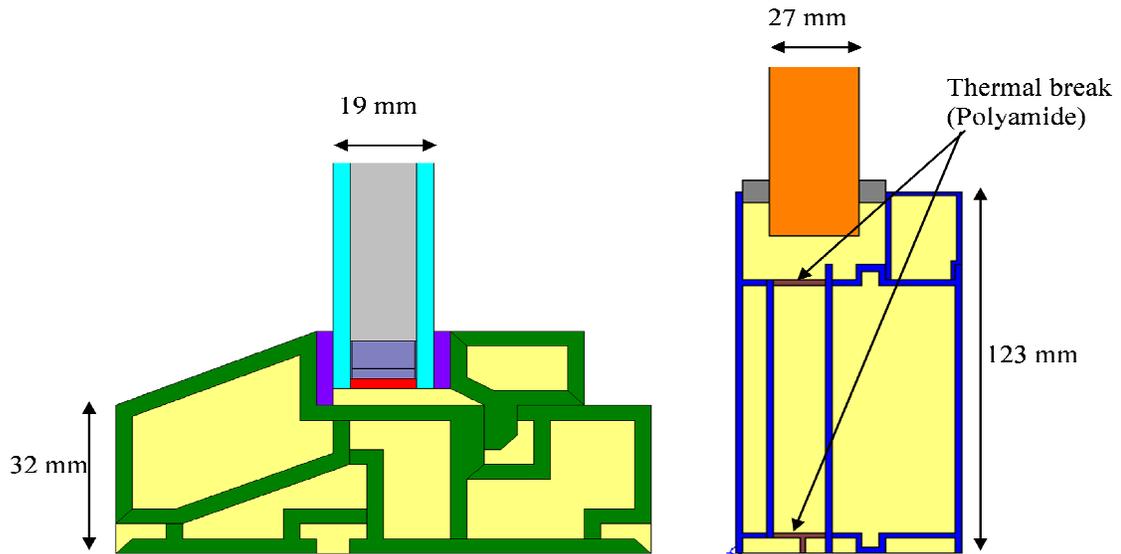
Cross section of window frames; To the left, a PVC window frame (S1) and to the right, an aluminum window frame (S2)
